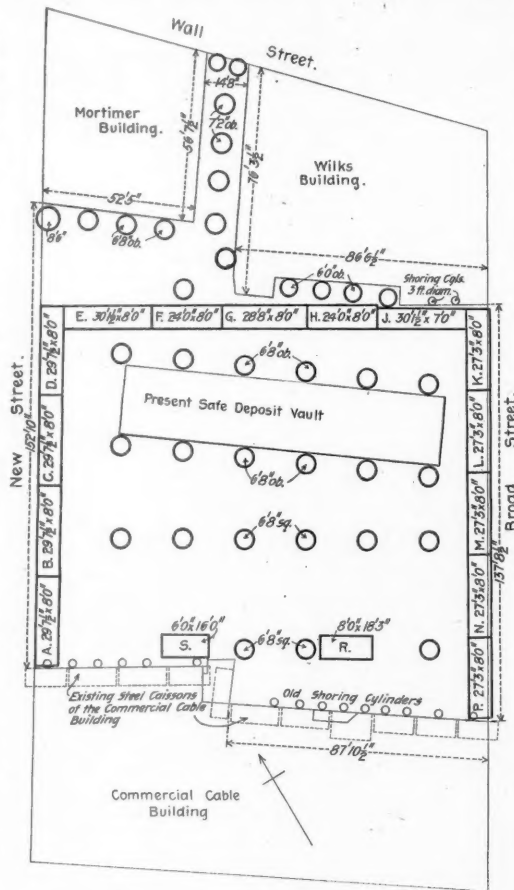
General Plan of Stock Exchange and Adjoining Buildings.
